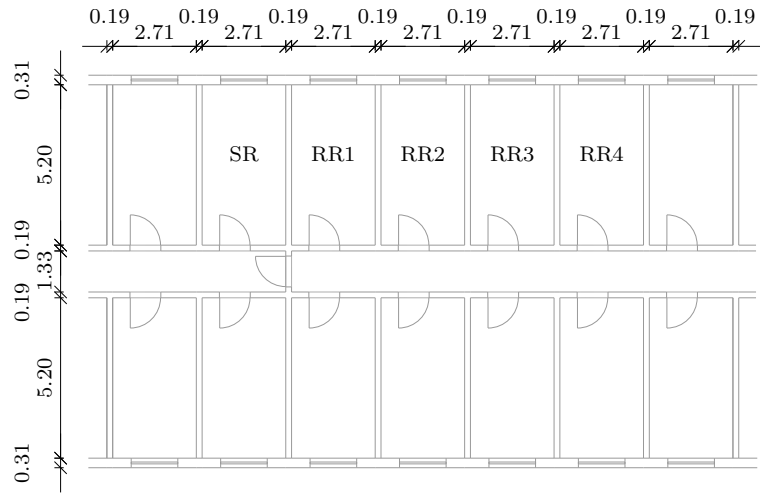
Field test construction: Ground floor plan of the timber-frame building (dimensions in metres).
